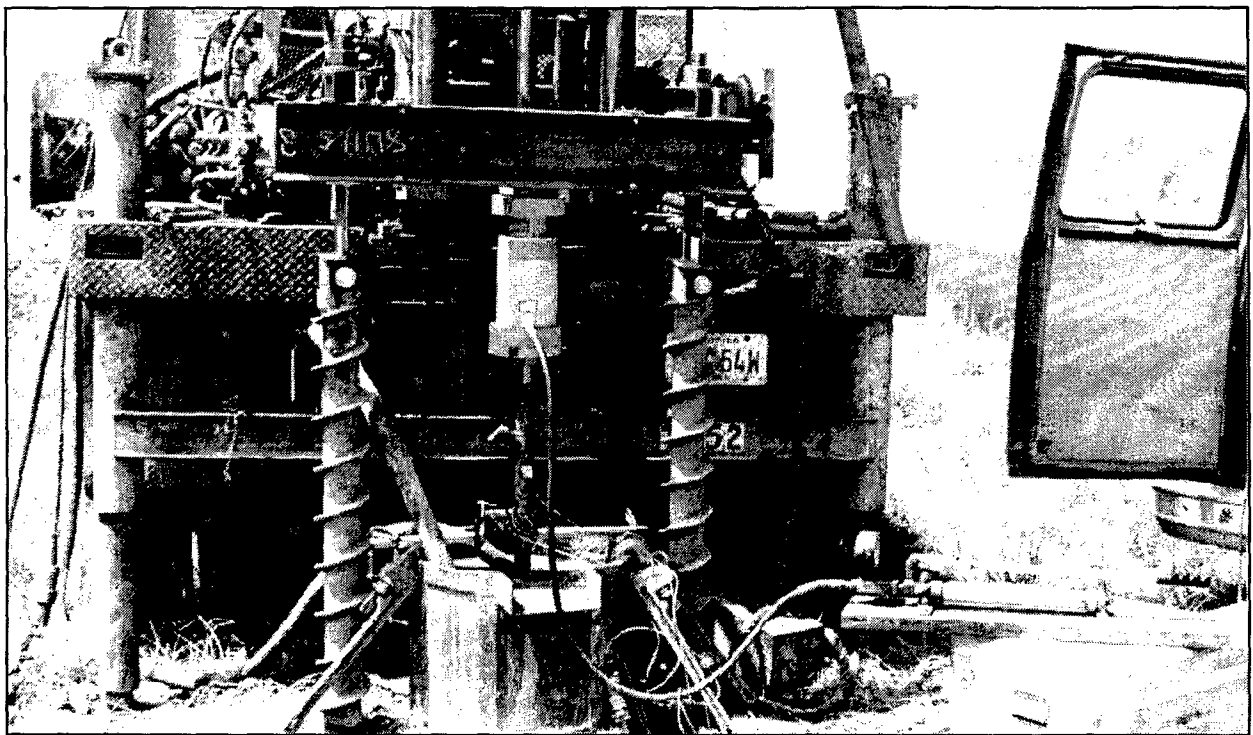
(b): Static Compression Test Setup at White City, TP6, FL Site
